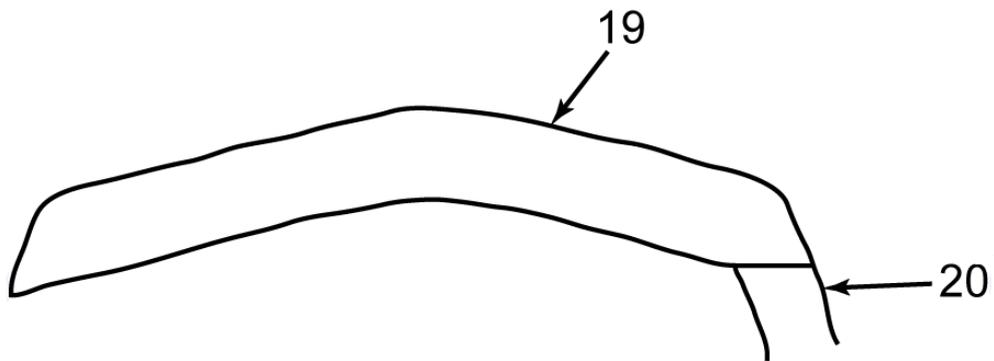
Hall, truss C3, north face, showing the location of samples 19 and 20
